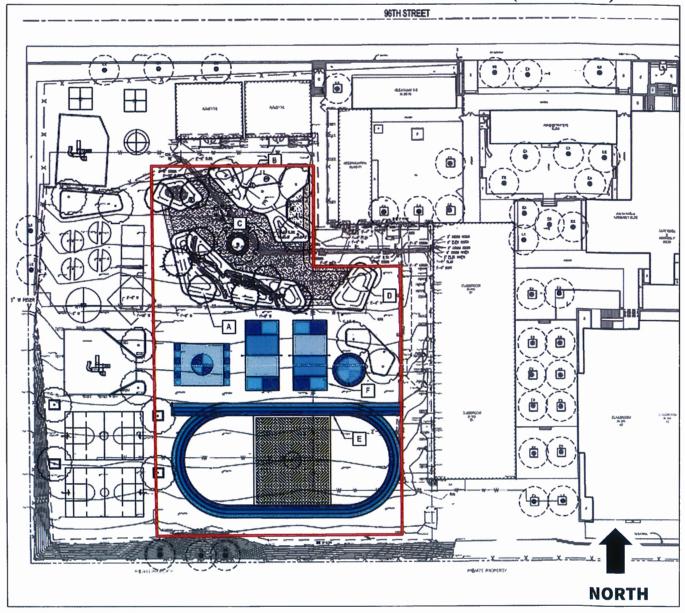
## EXHIBIT A - LOS ANGELES ES SITE PLAN (not to scale)
